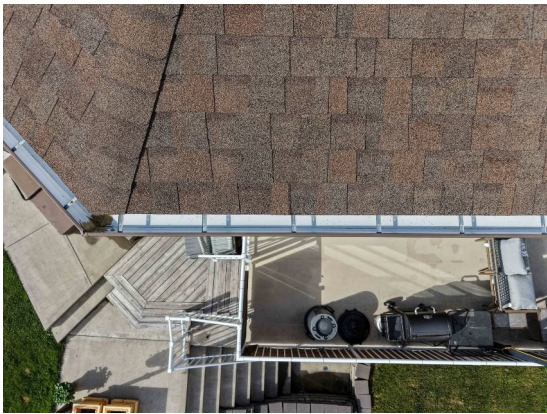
Detail 2 — Drainage / Gutters and Downspouts, South.
